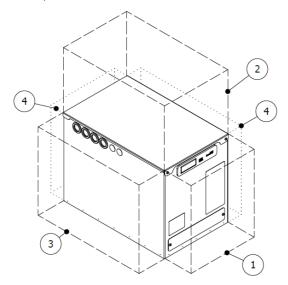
Spacing (in mm) surrounding the Sunamp Ltd. Heat Battery
